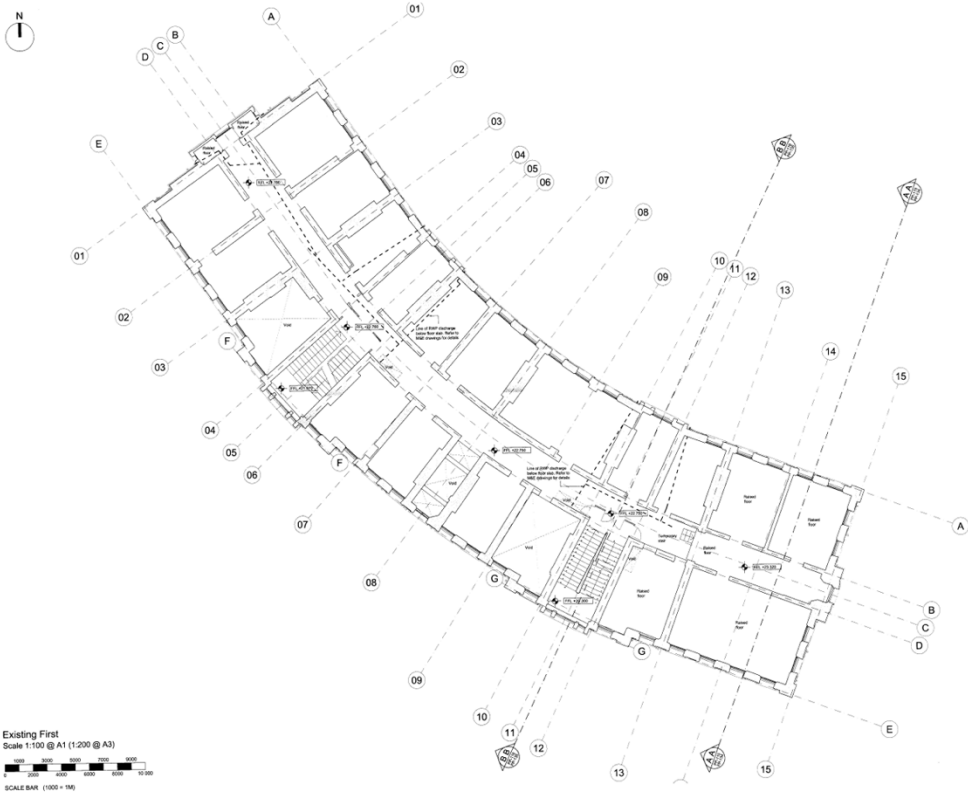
Existing first floor plan (ref. 2010/3304/P)
